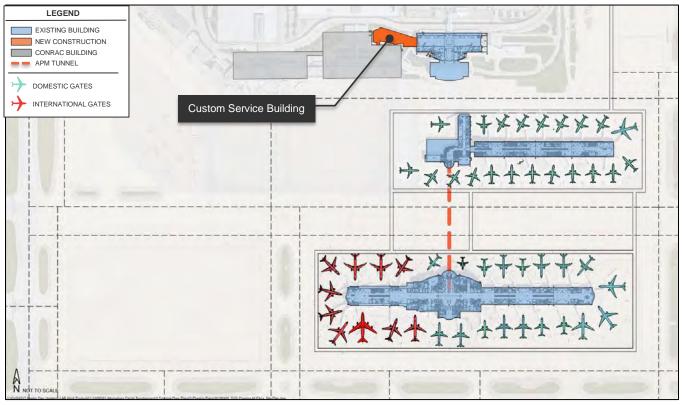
PAL 1 TERMINAL PLAN DETAIL
